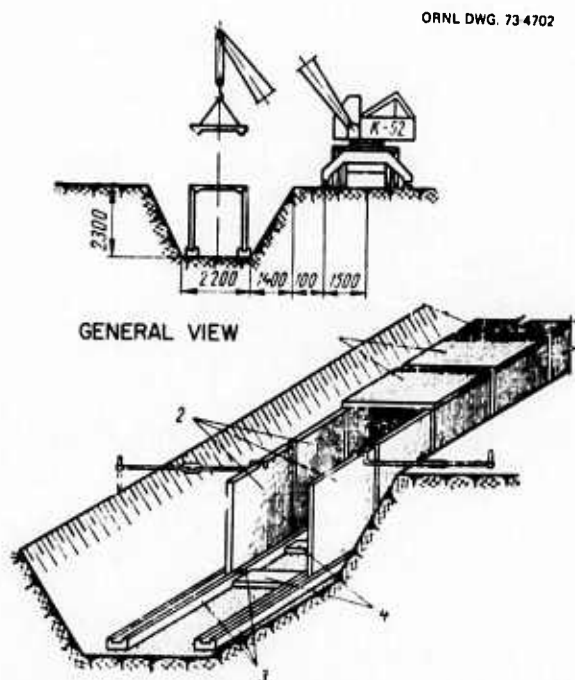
Installing the shelter with reinforced concrete components: (1) platform of the shelter; (2) platform of the walls; (3) foundations; (4) reinforced concrete cross braces.
